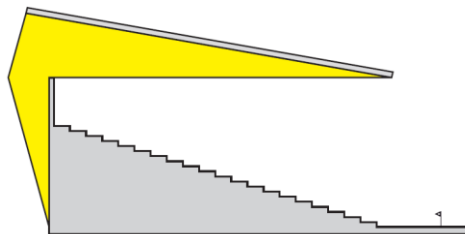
A cantilever style roofing structure (John, Sheard and Vickery 2007)
